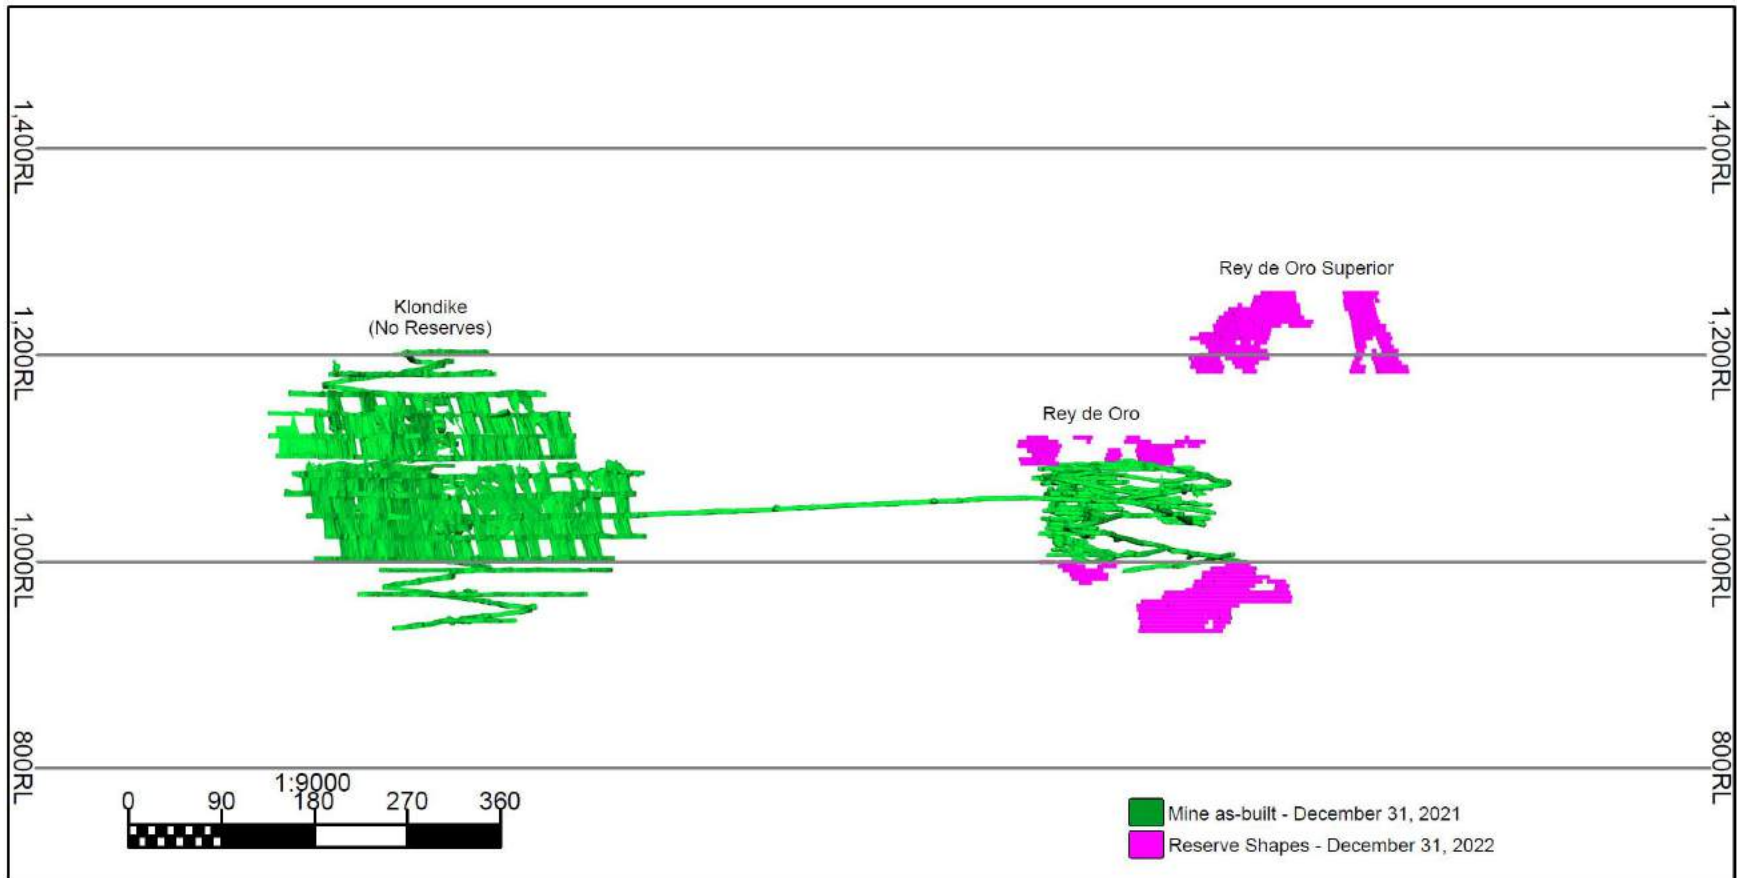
Isometric long section looking north-east showing the Klondike/Rey de Oro deposit as-builts and reserve locations
